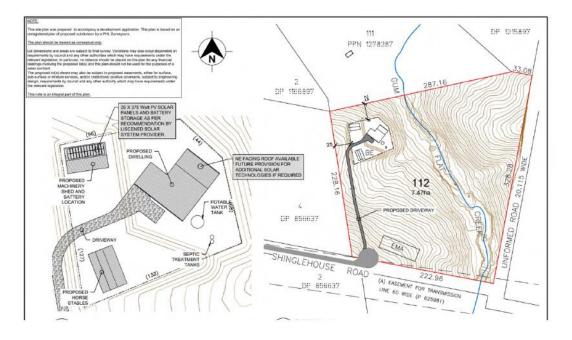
Indicative site plan for proposed Lot 112, showing proposed locations of solar panels and battery
